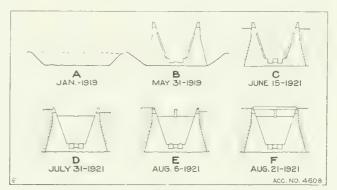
THE SUCCESSIVE STEPS IN BUILDING THE LOCKINGTON OUTLET WORKS.
